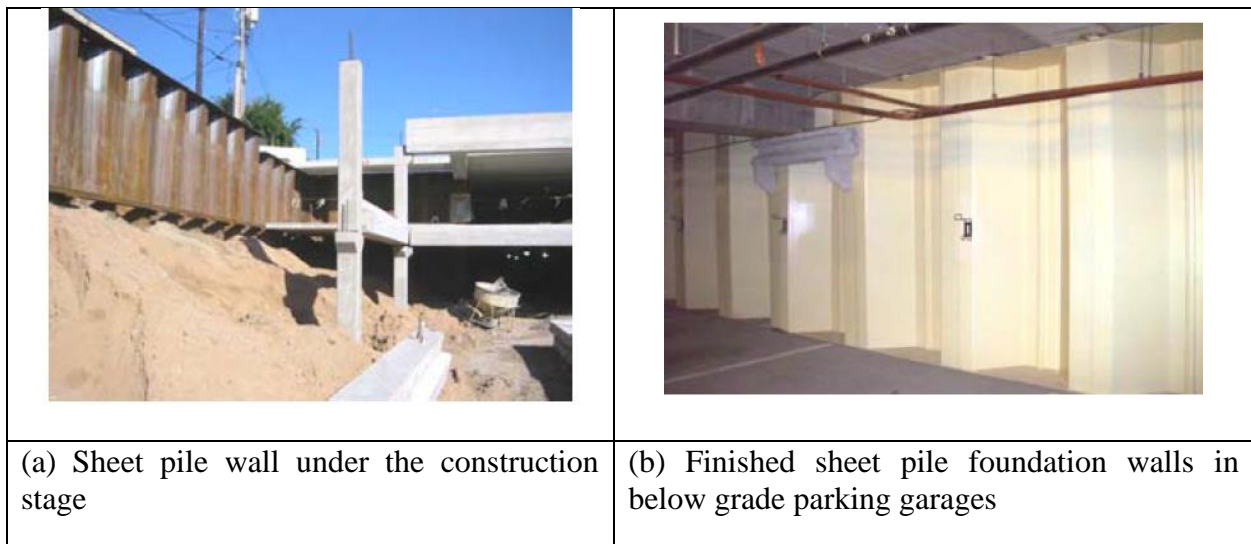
Steel sheet piles used as permanent foundation and retention systems (Underwood & Greenlee, 2010)
